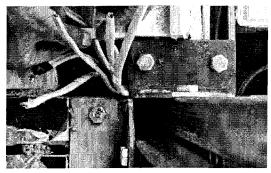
Structural columns and beam also function as conduits for electrical and plumbing systems in the open grid system
